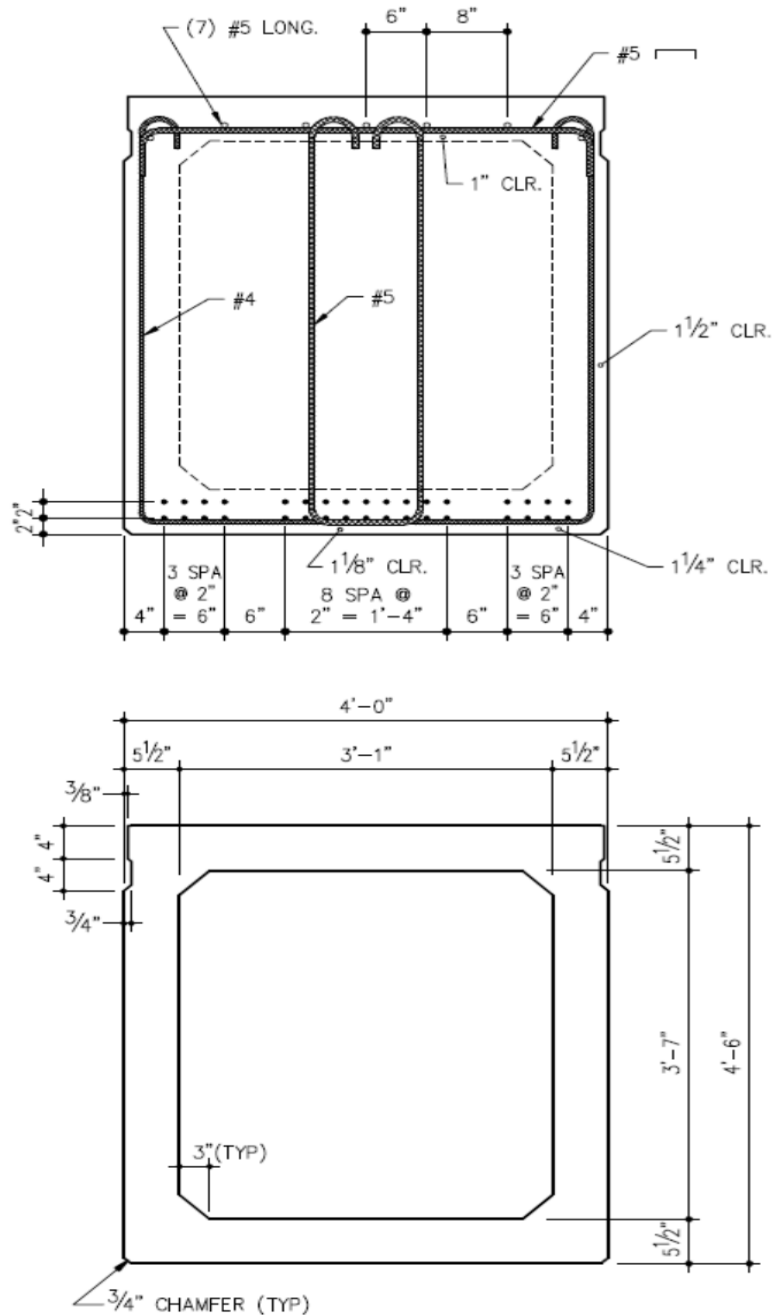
Dimensions and reinforcement layout for AASHTO B54x48 box beam (source: <http://www.prestressservices.com/products/bridge>)
